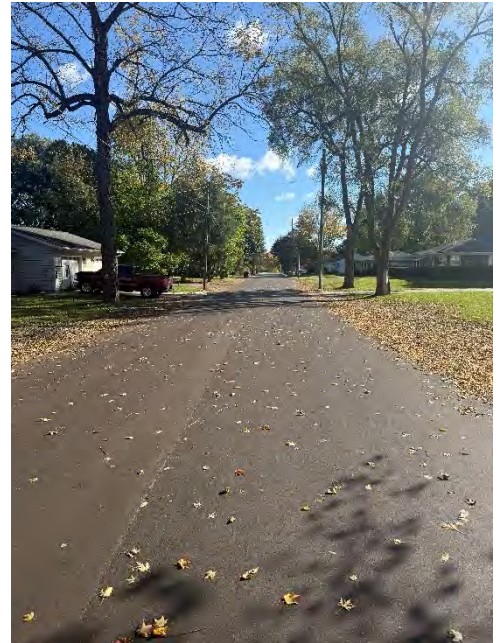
Contract #1 – Top Course paving and restoration completed at State Street.
